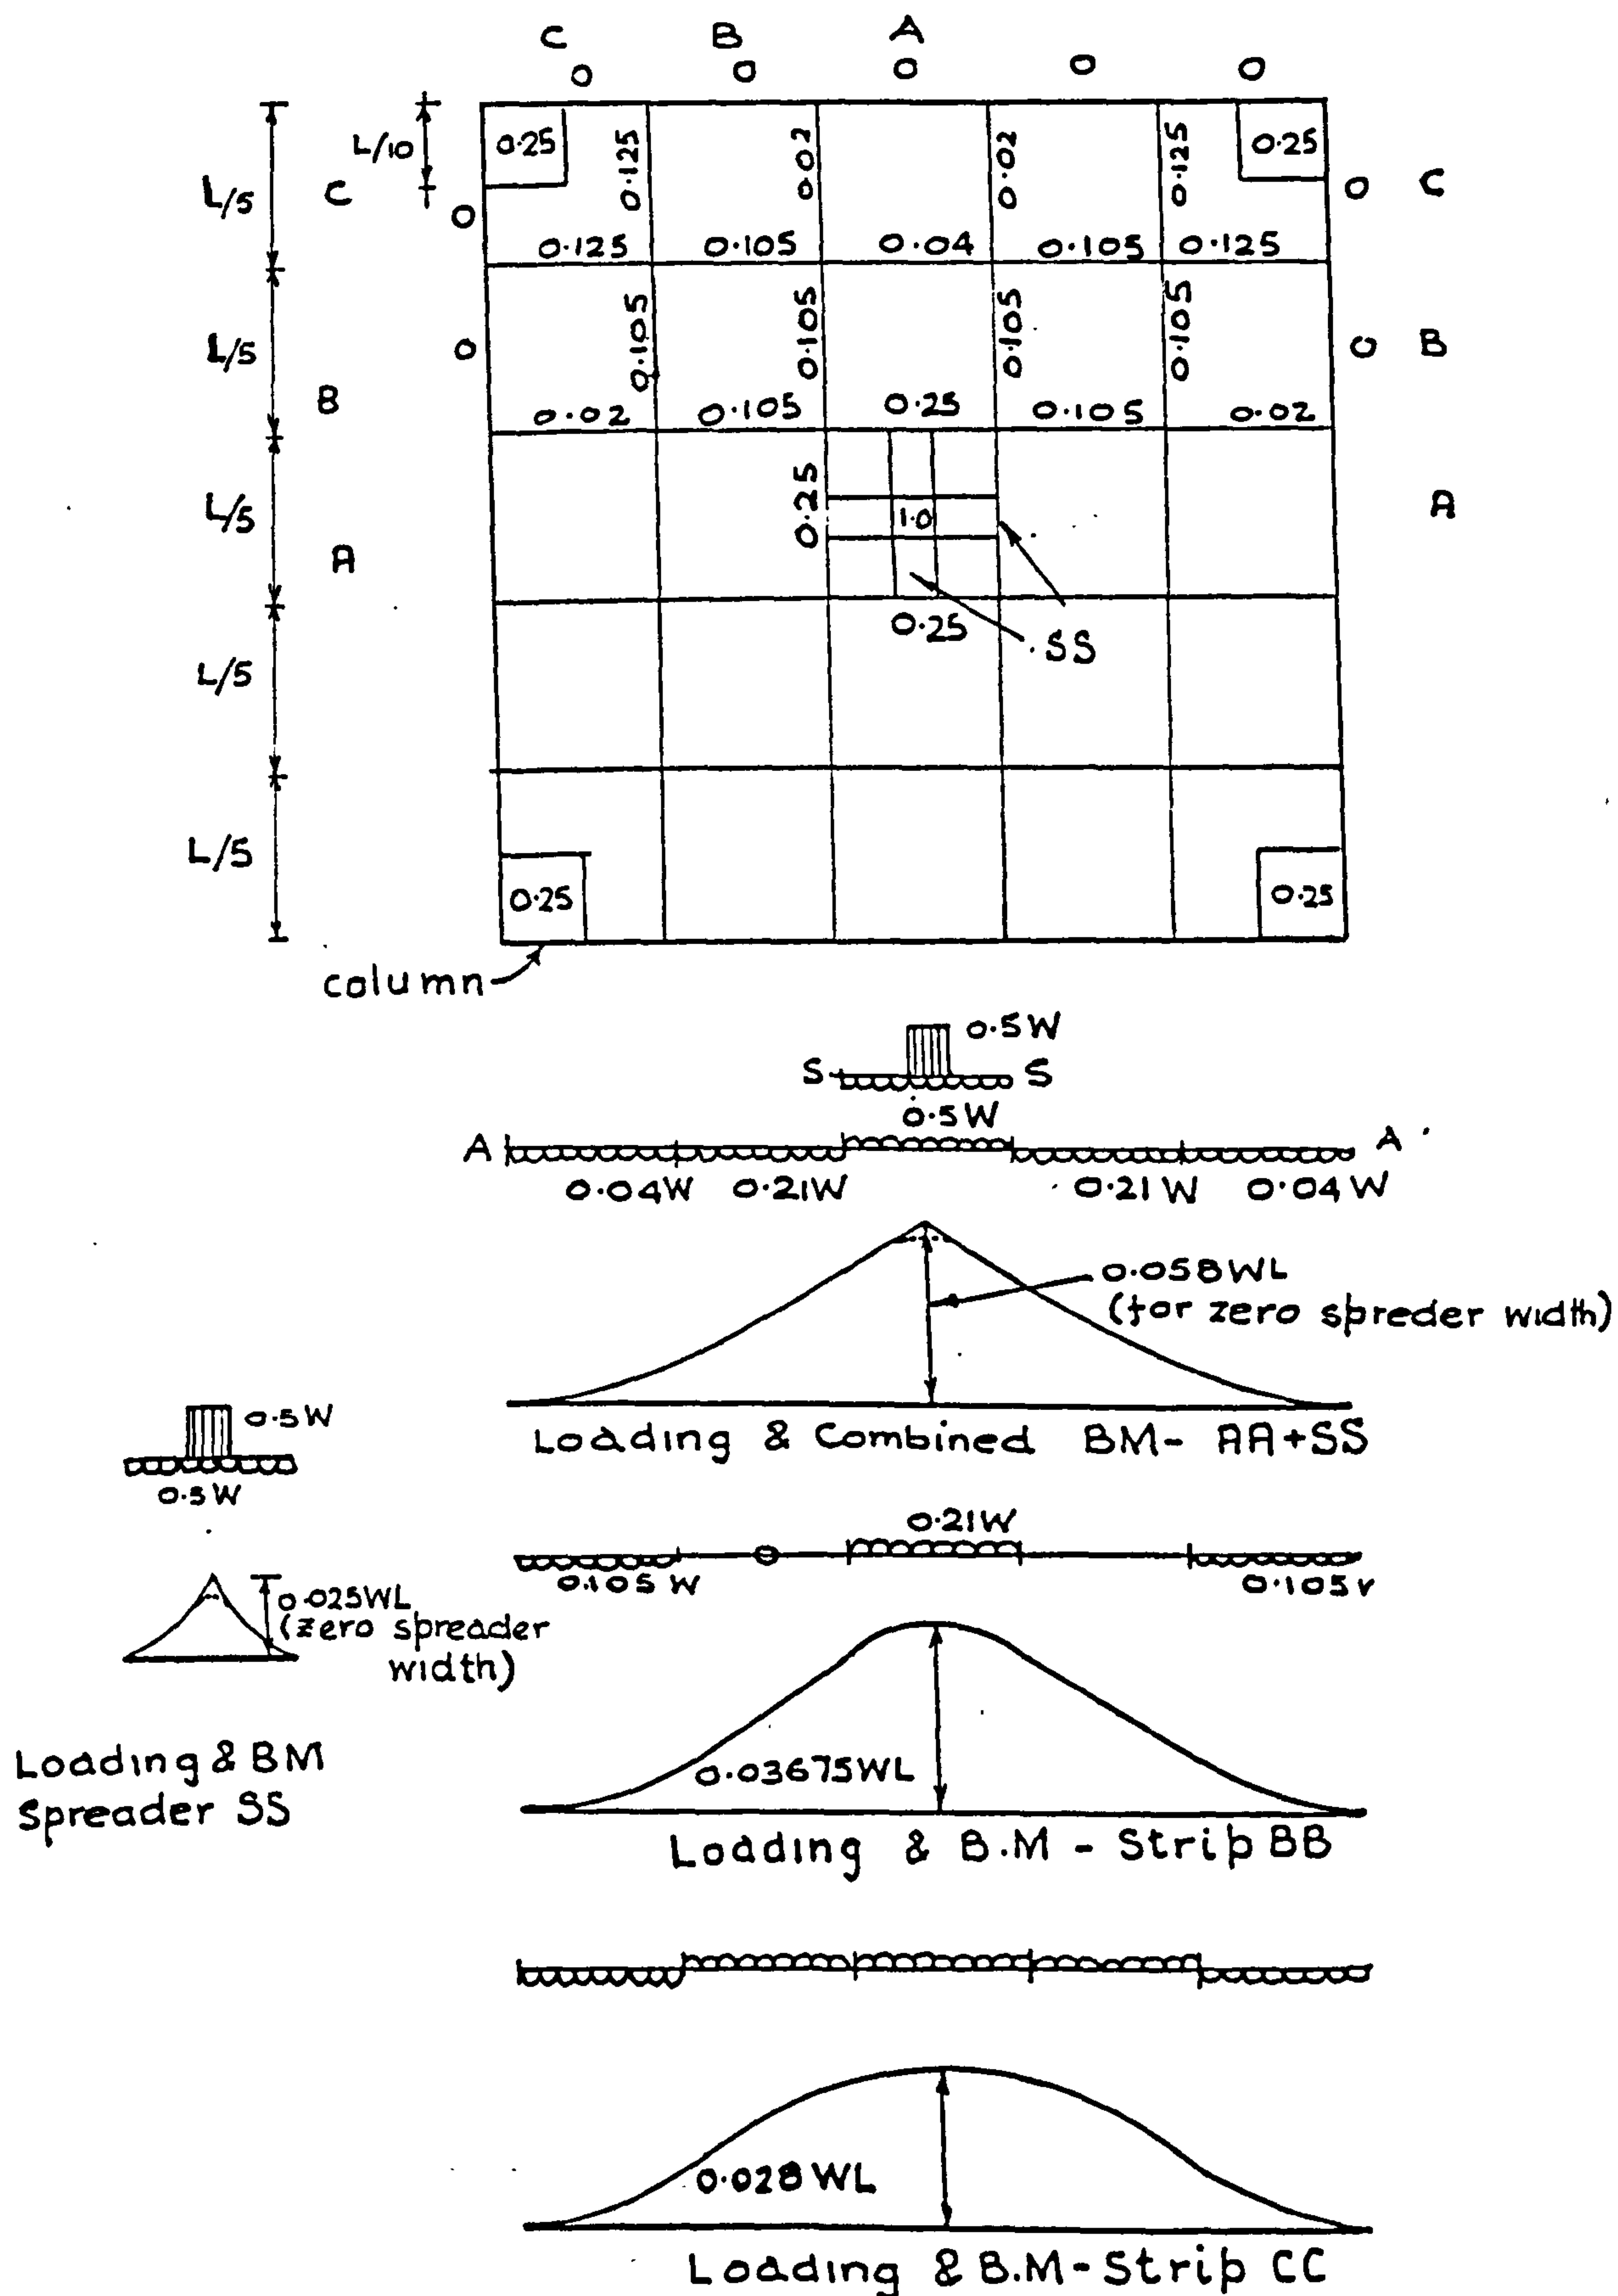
APPLICATION OF STRIP DEFLECTION METHOD FOR A SQUARE SLAB SUPPORTED AT THE FOUR CORNERS AND CARRYING A CENTRAL LOAD.
